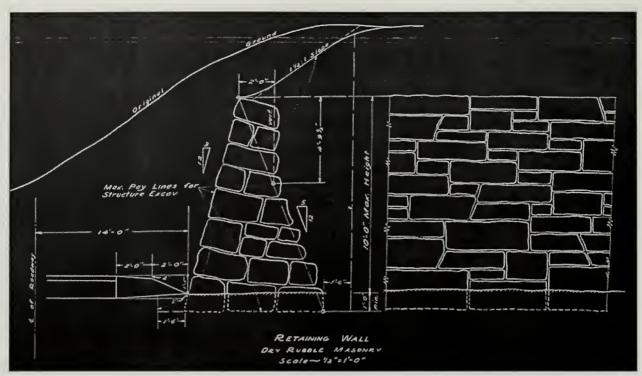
Detail of a dry-laid stone retaining wall from Day Mountain Road, Kebo Mountain Road Extension, and Champlain Mountain Road, 1939. (U.S. Department of Agriculture, Bureau of Public Roads, Project 9A1, Sheet 12 of x, June 1939 and Federal Works Agency, Public Roads Administration, Project 6A3-8A1, Sheet 13 of x, September 1939)
